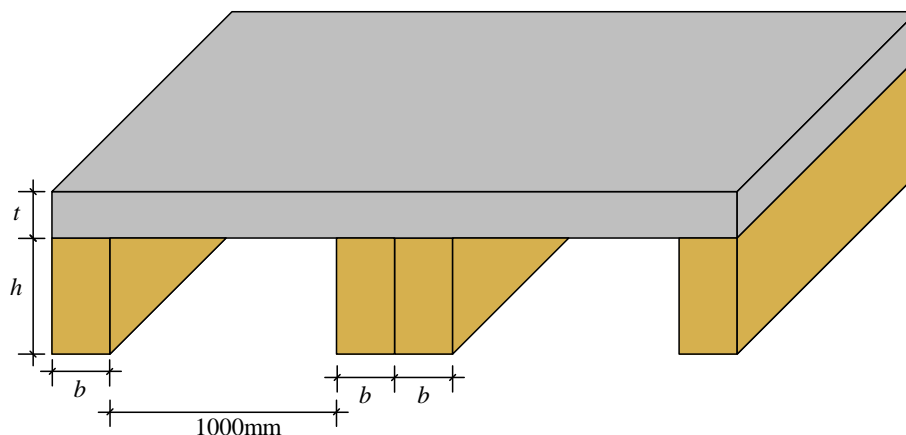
Illustration of one timber concrete composite floor element consisting of two bays.
